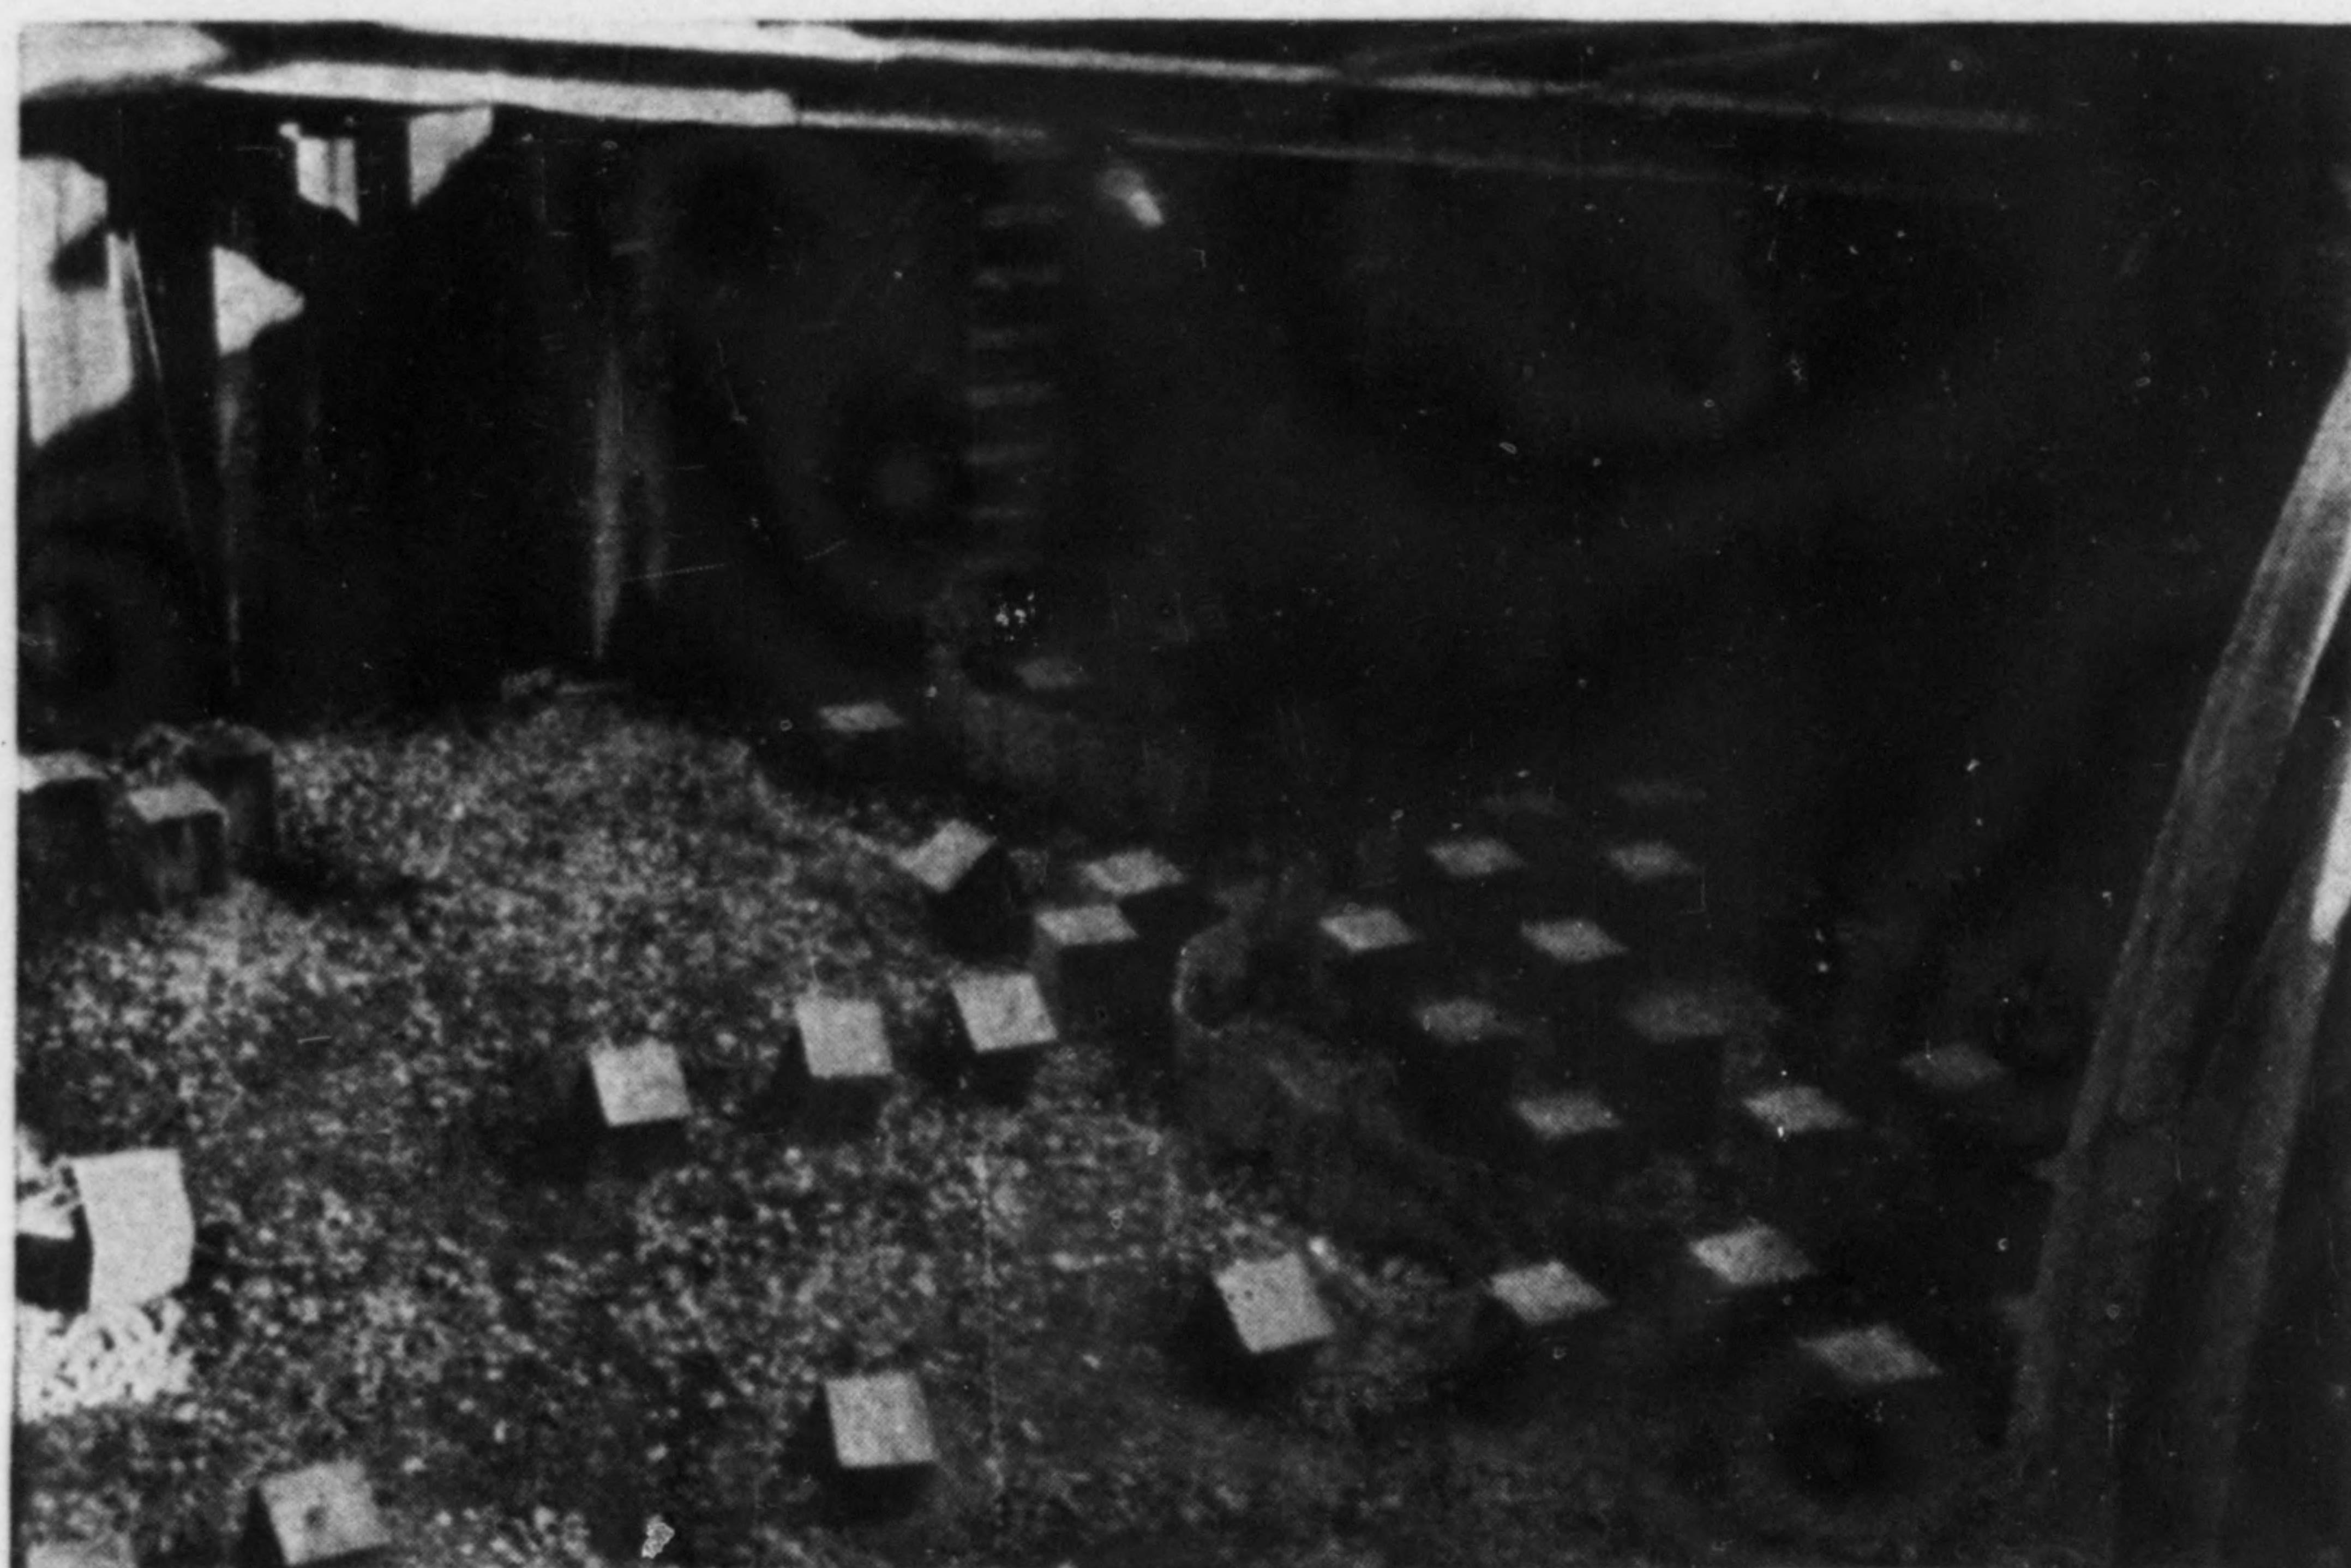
H-beams driven to shale, and capped to distribute load on concrete support west pier after a circular sheetpile caisson scheme was abandoned.
